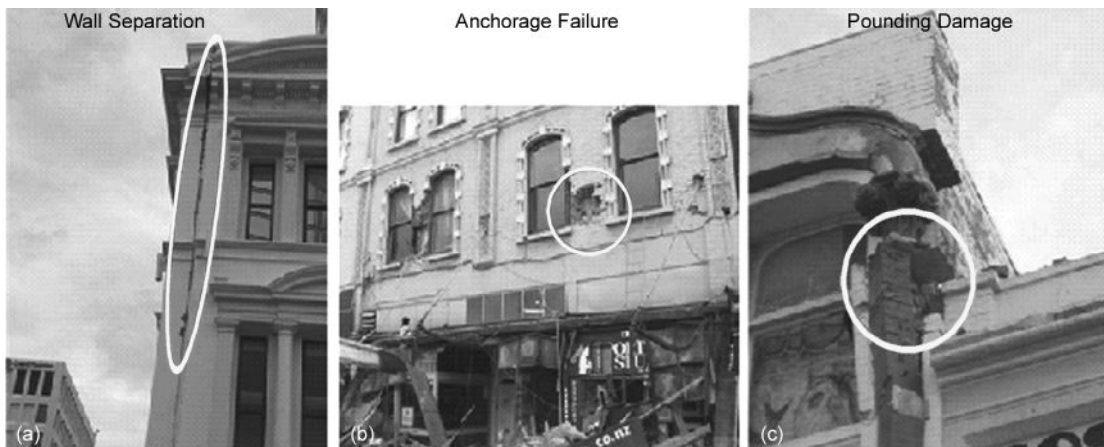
a) Separation of return walls; b) Anchorage failure of masonry wall; c) Pounding damage observed in the September 2010 earthquake.
